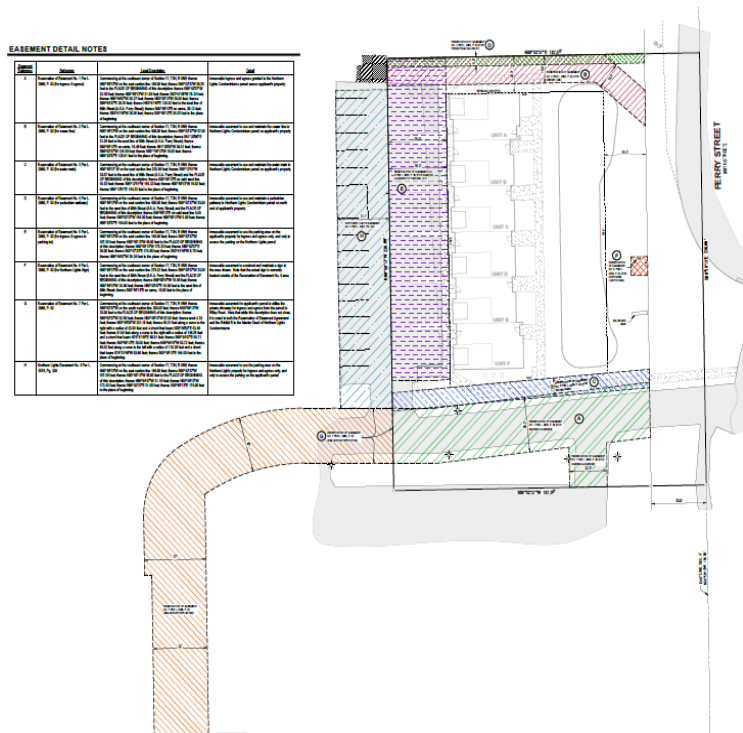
Color Coded Easement Exhibit (Sheet C-901 of the plan set)
